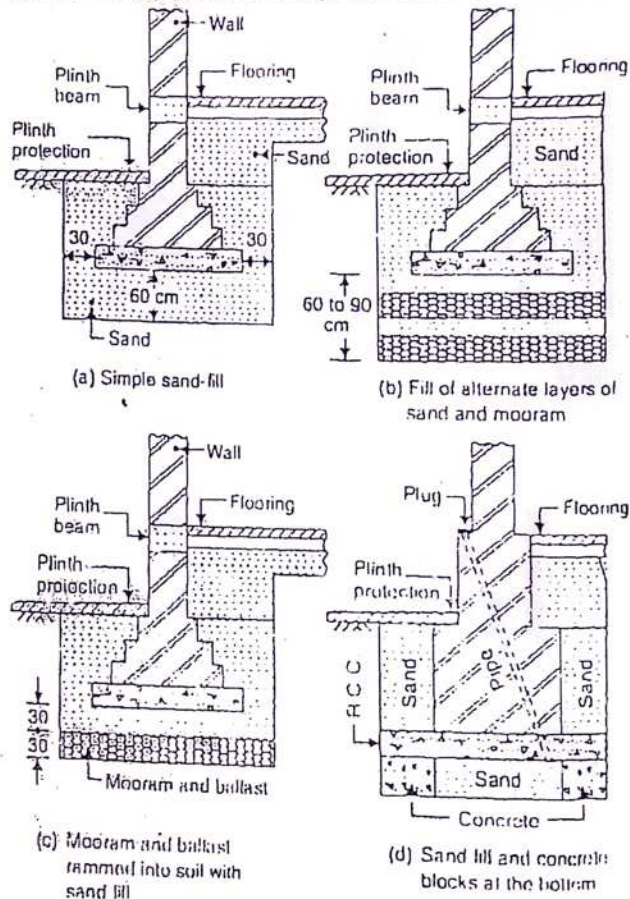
STRIP FOOTING WITH SPECIAL TREATMENT
